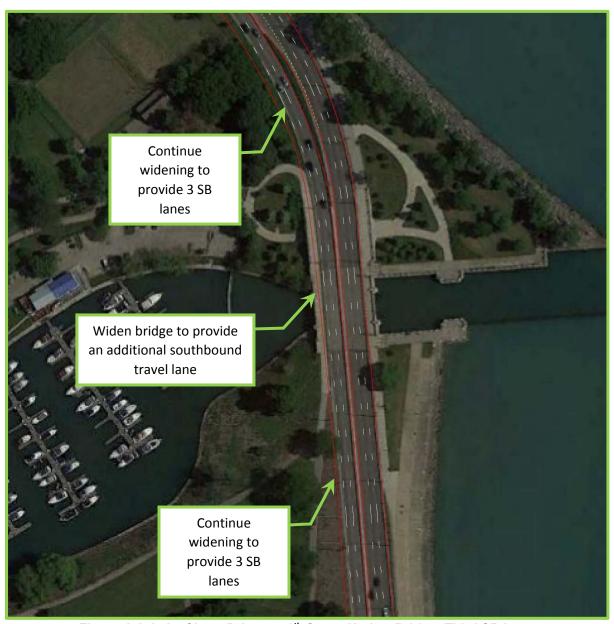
Lake Shore Drive at 59th Street Harbor Bridge, Third SB Lane
